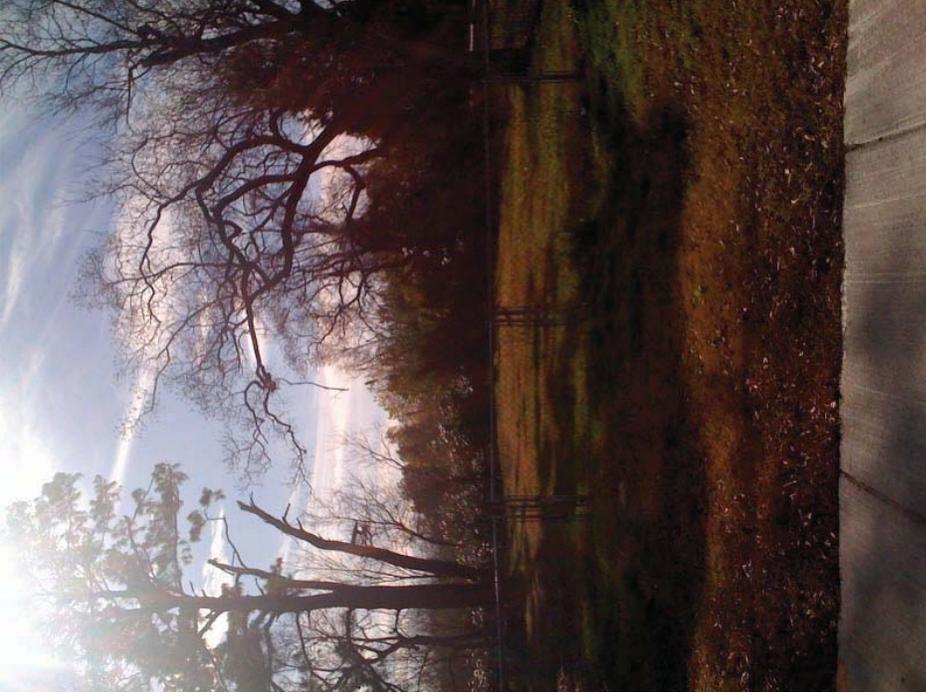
Lot to be used as entrance to Parks and Parkways material laydown area.
